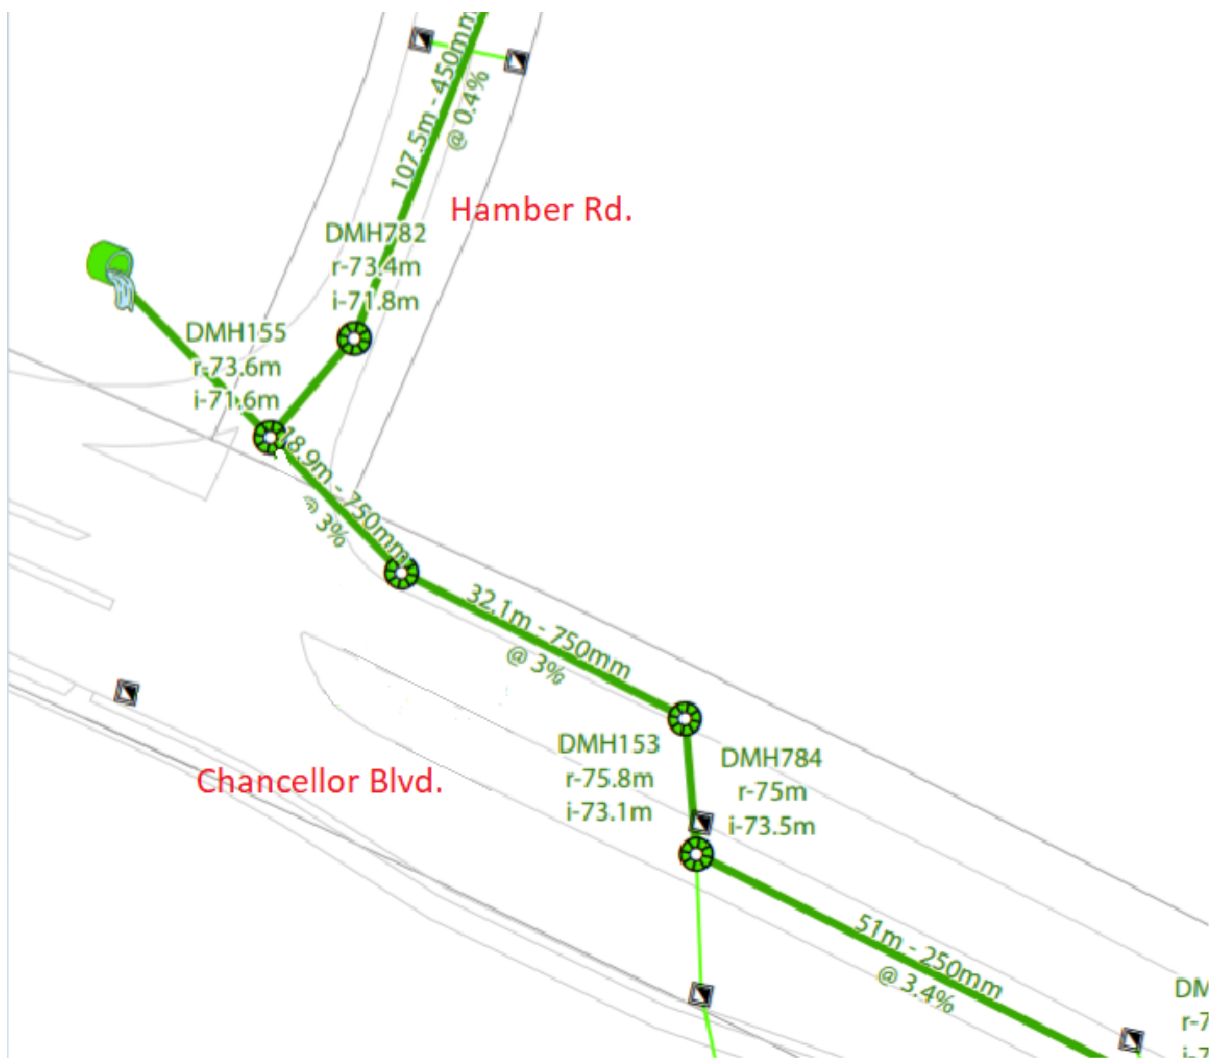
Existing Drainage Pipeline Utility Drawing at the Intersection of Chancellor Boulevard with Hamber Road
